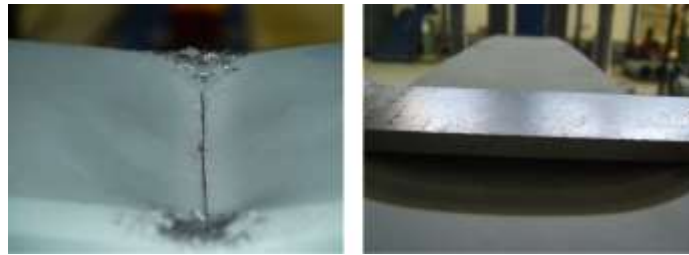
Fracture of Specimen 9, located at the top flange at crown.
